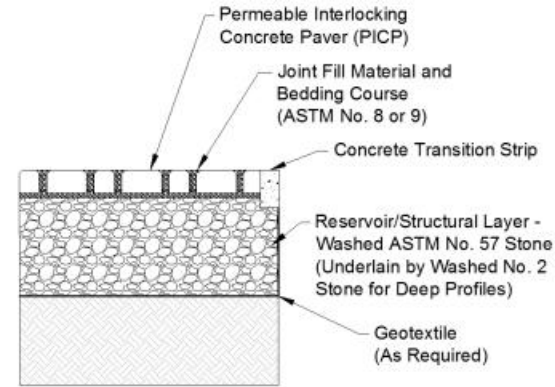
TYPICAL PICP CROSS SECTION.
